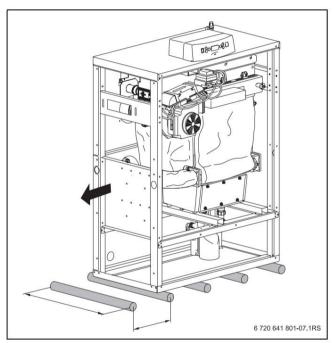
Transporting the boiler on rollers (dimensions in mm)
